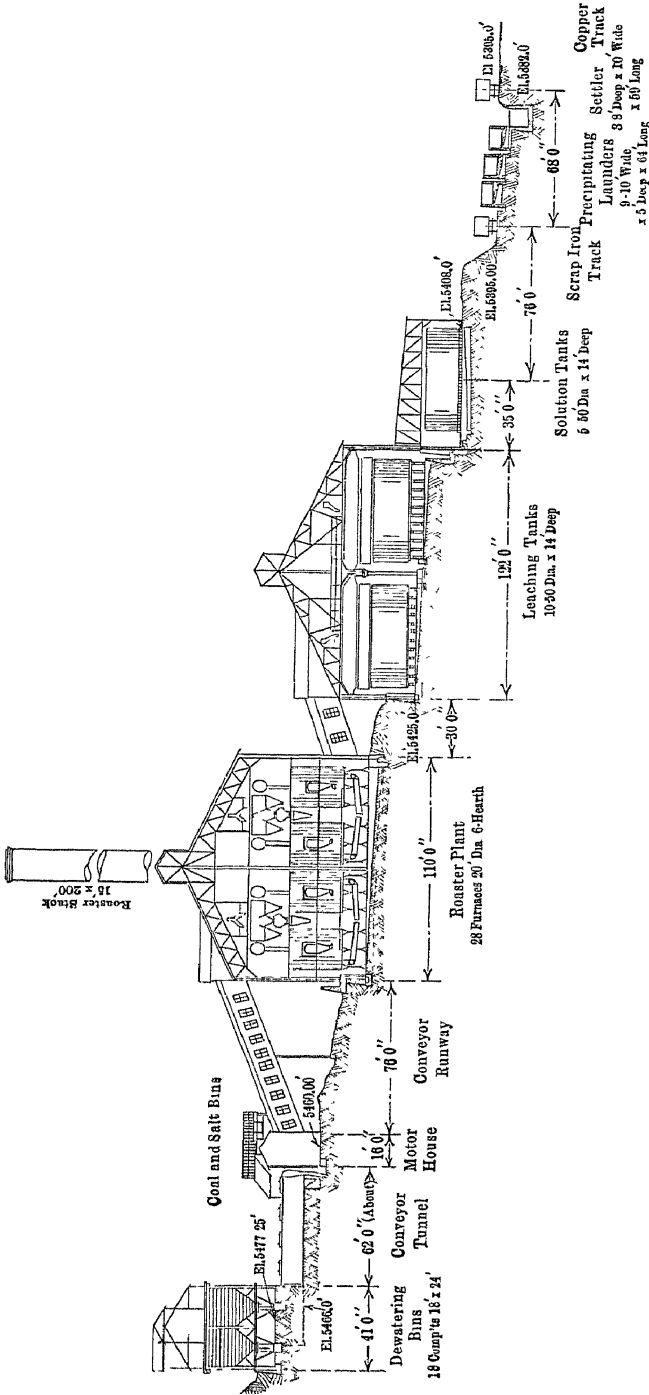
GENERAL PROFILE OF 2,000-TON LEACHING PLANT AT ANACONDA.
